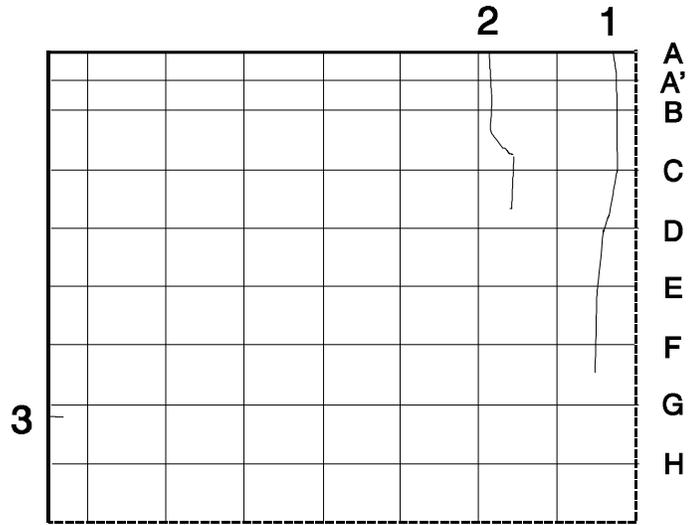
POJ-PU-74-TH cracking patterns on south face of overhang at service load
